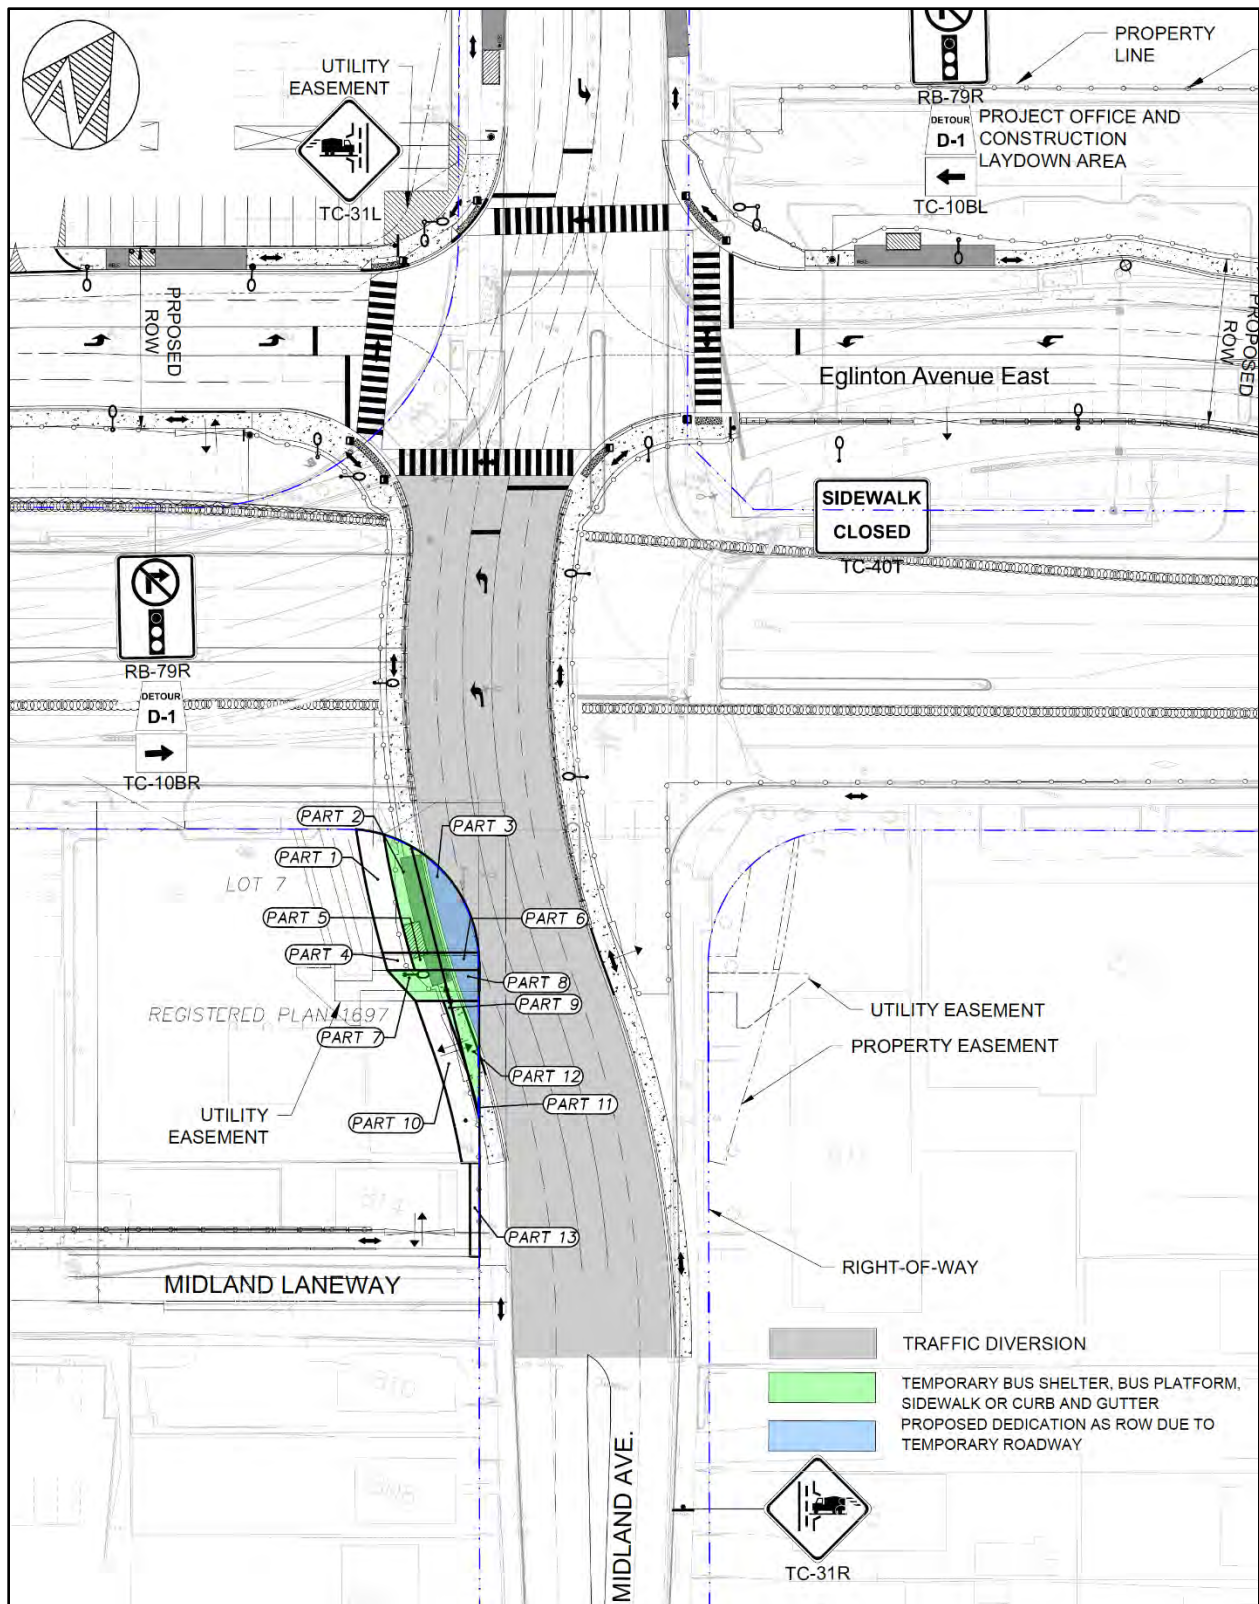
SSE-Kennedy Station Connection – Temporary Road Diversion (Stage 2A) Source: Metrolinx
